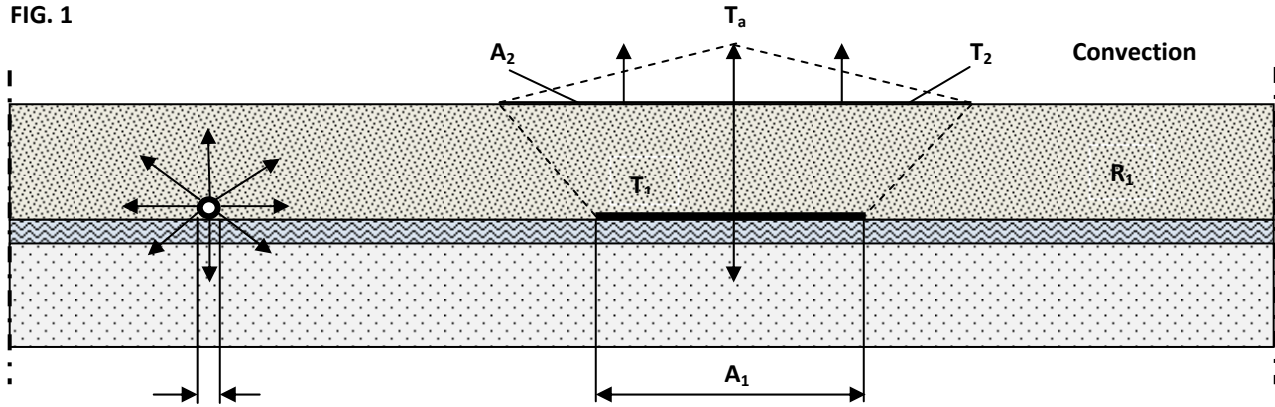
shows a cross sectional area of a floor with a cable or tubing and STEP Warmfloor™ flat element.
